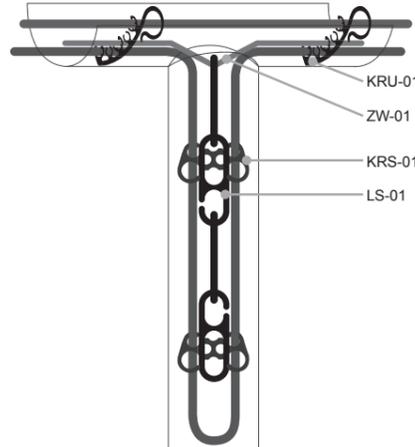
Fig. A diagram of arranging and application of accessories in a gutter / drain pipe
